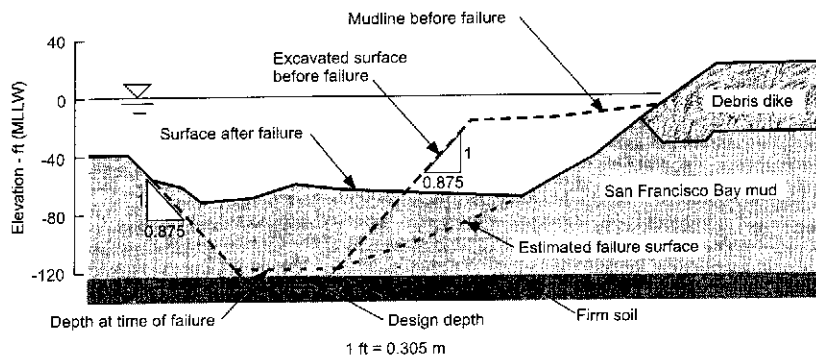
Cross Section through Excavated Trench at LASH Terminal after Failure
